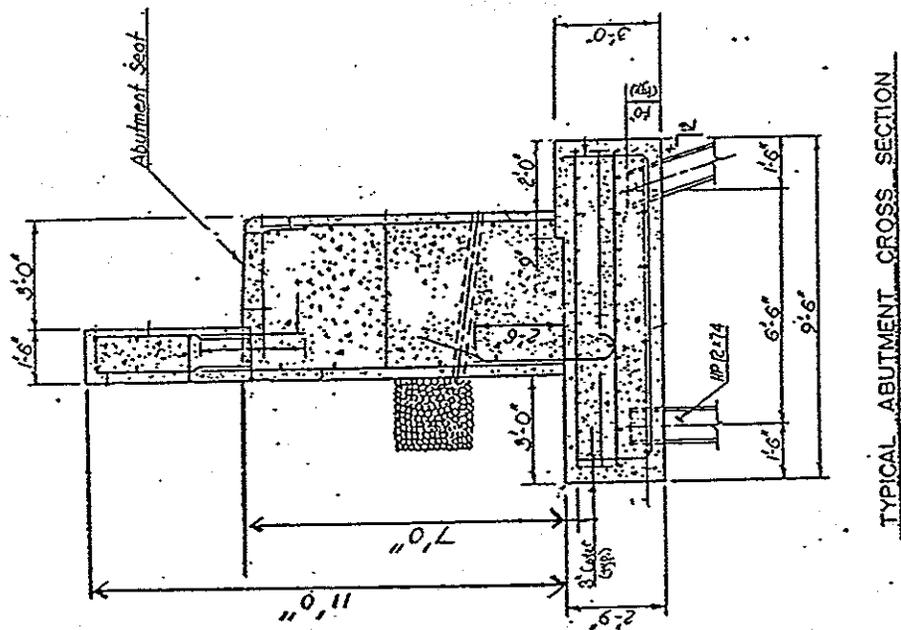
Jointless/Integral Stub Abutment Design Examples (Burke, 1990)
